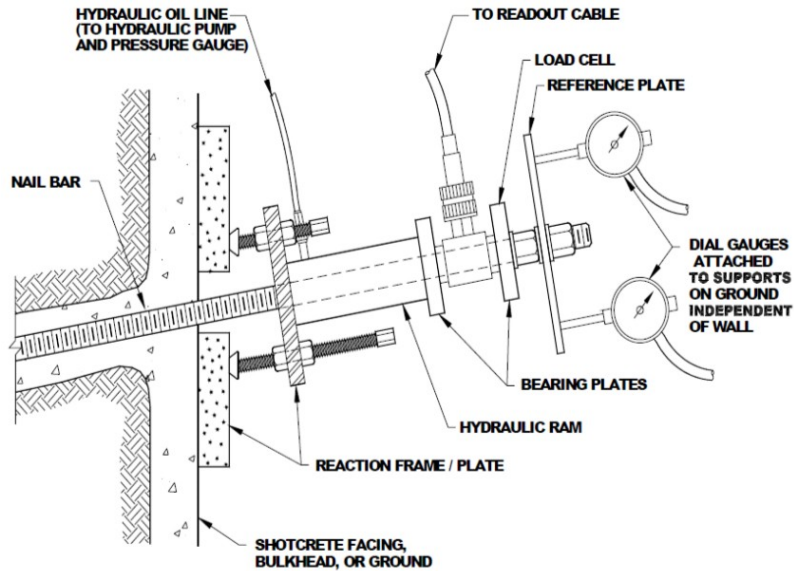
Soil Nail Load Testing Setup (after FHWA, 2003).
